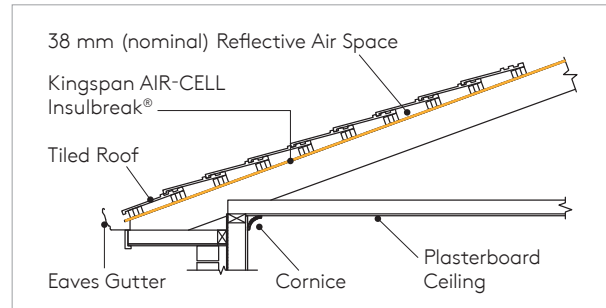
Side elevation of Kingspan AIR-CELL Insulbreak® 55 in a timber framed tiled roof with an attic space and a flat ceiling
